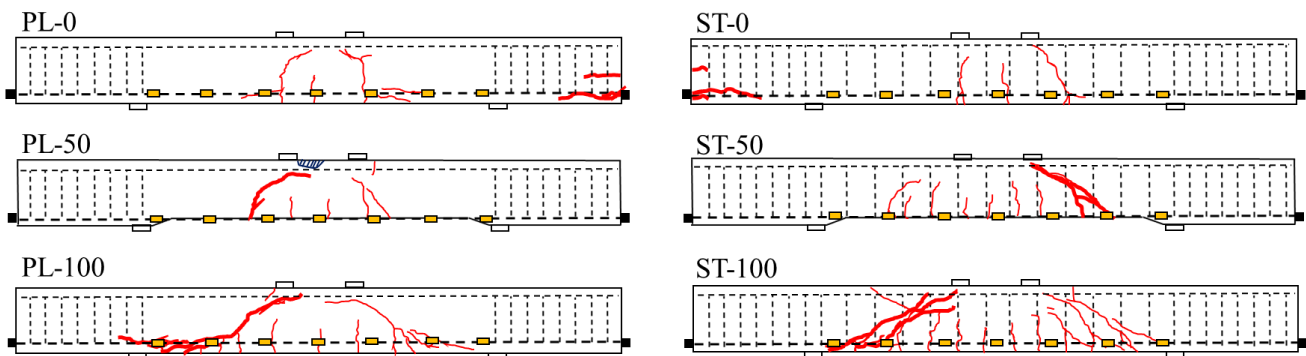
Crack pattern (thick line: dominant cracks at failure, shaded area: concrete spoiled area at failure).
